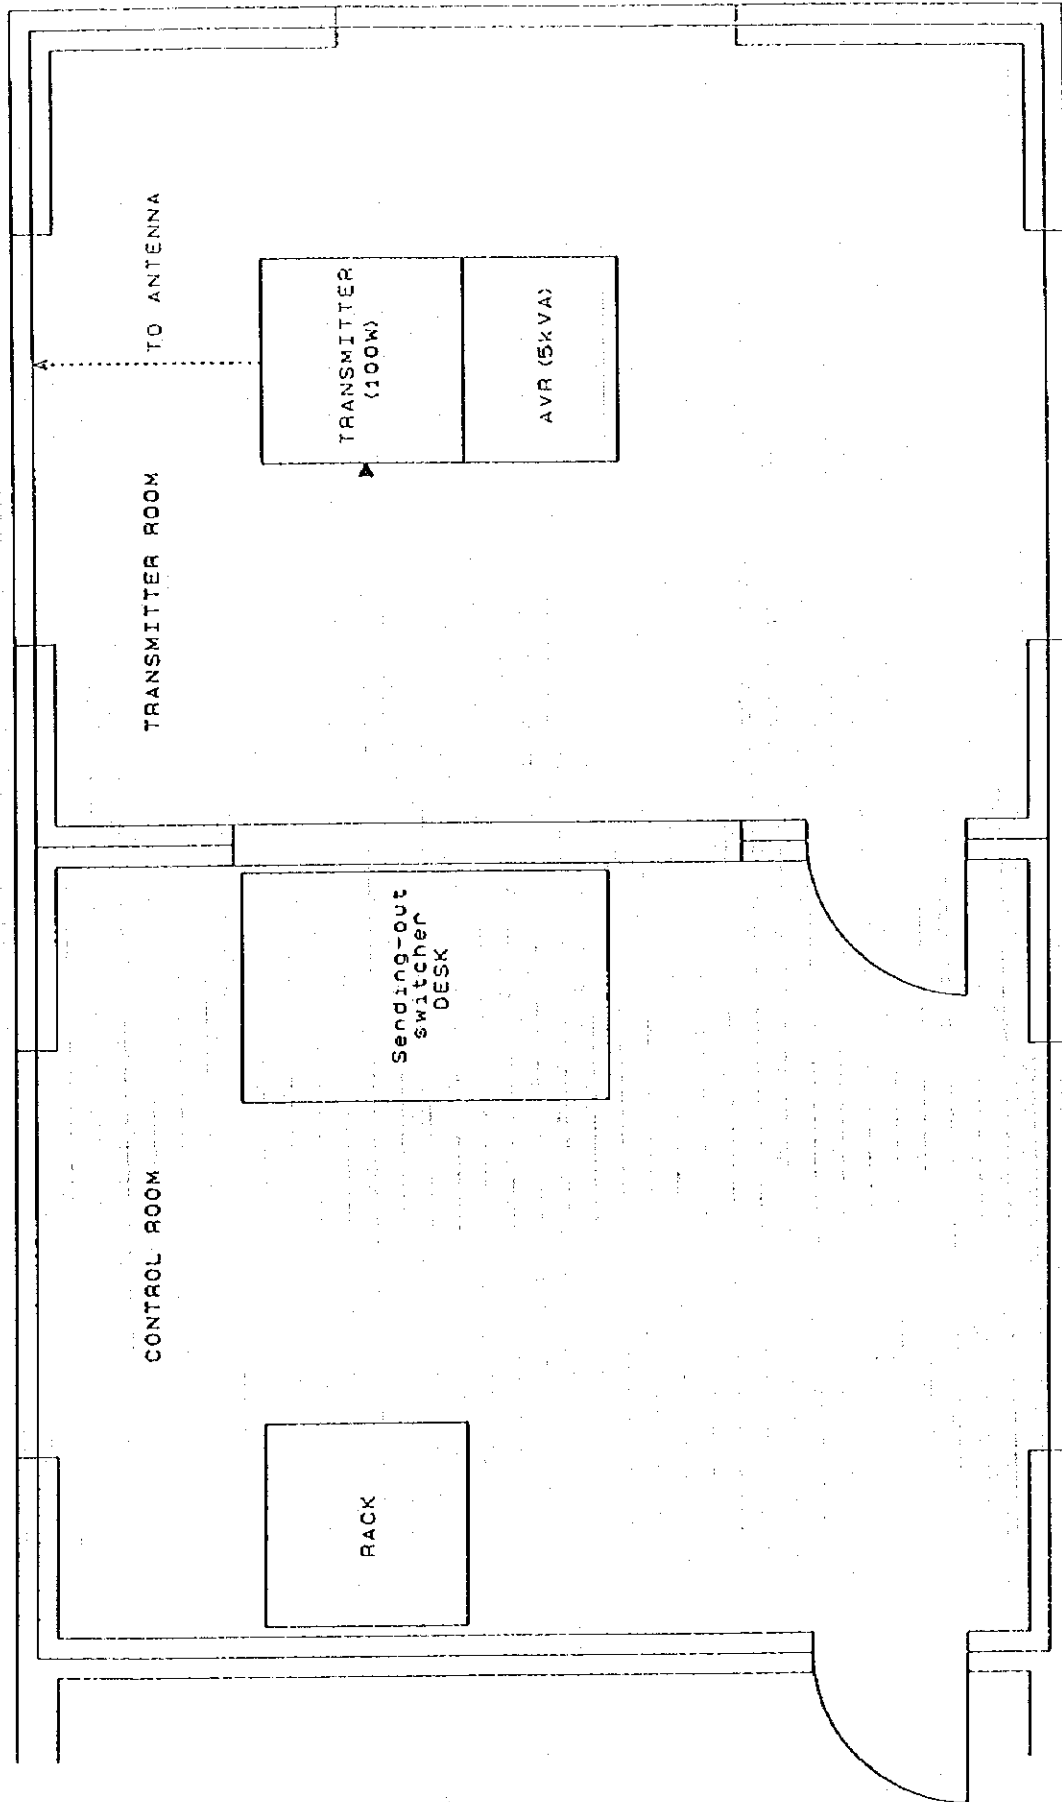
SIHANOUKVILLE TV TRANSMITTING STATION, EQUIPMENT LAYOUT
